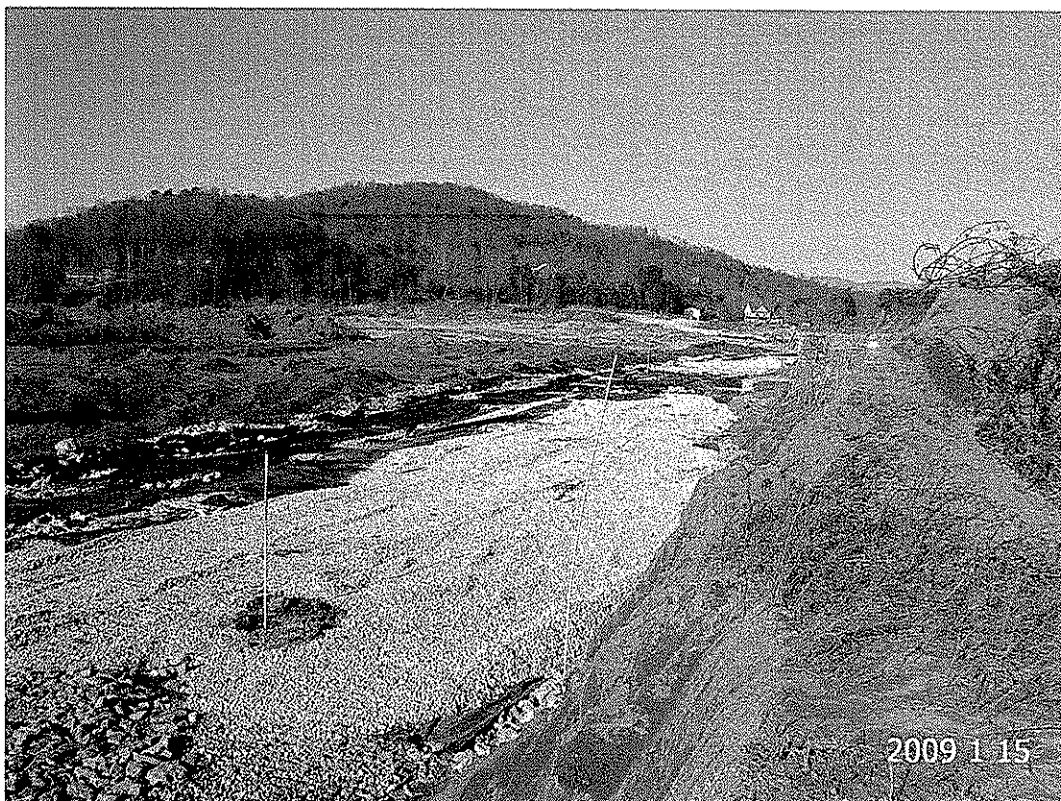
PZ-2 and Marker Pipe at Concrete Pipe through Dike D
